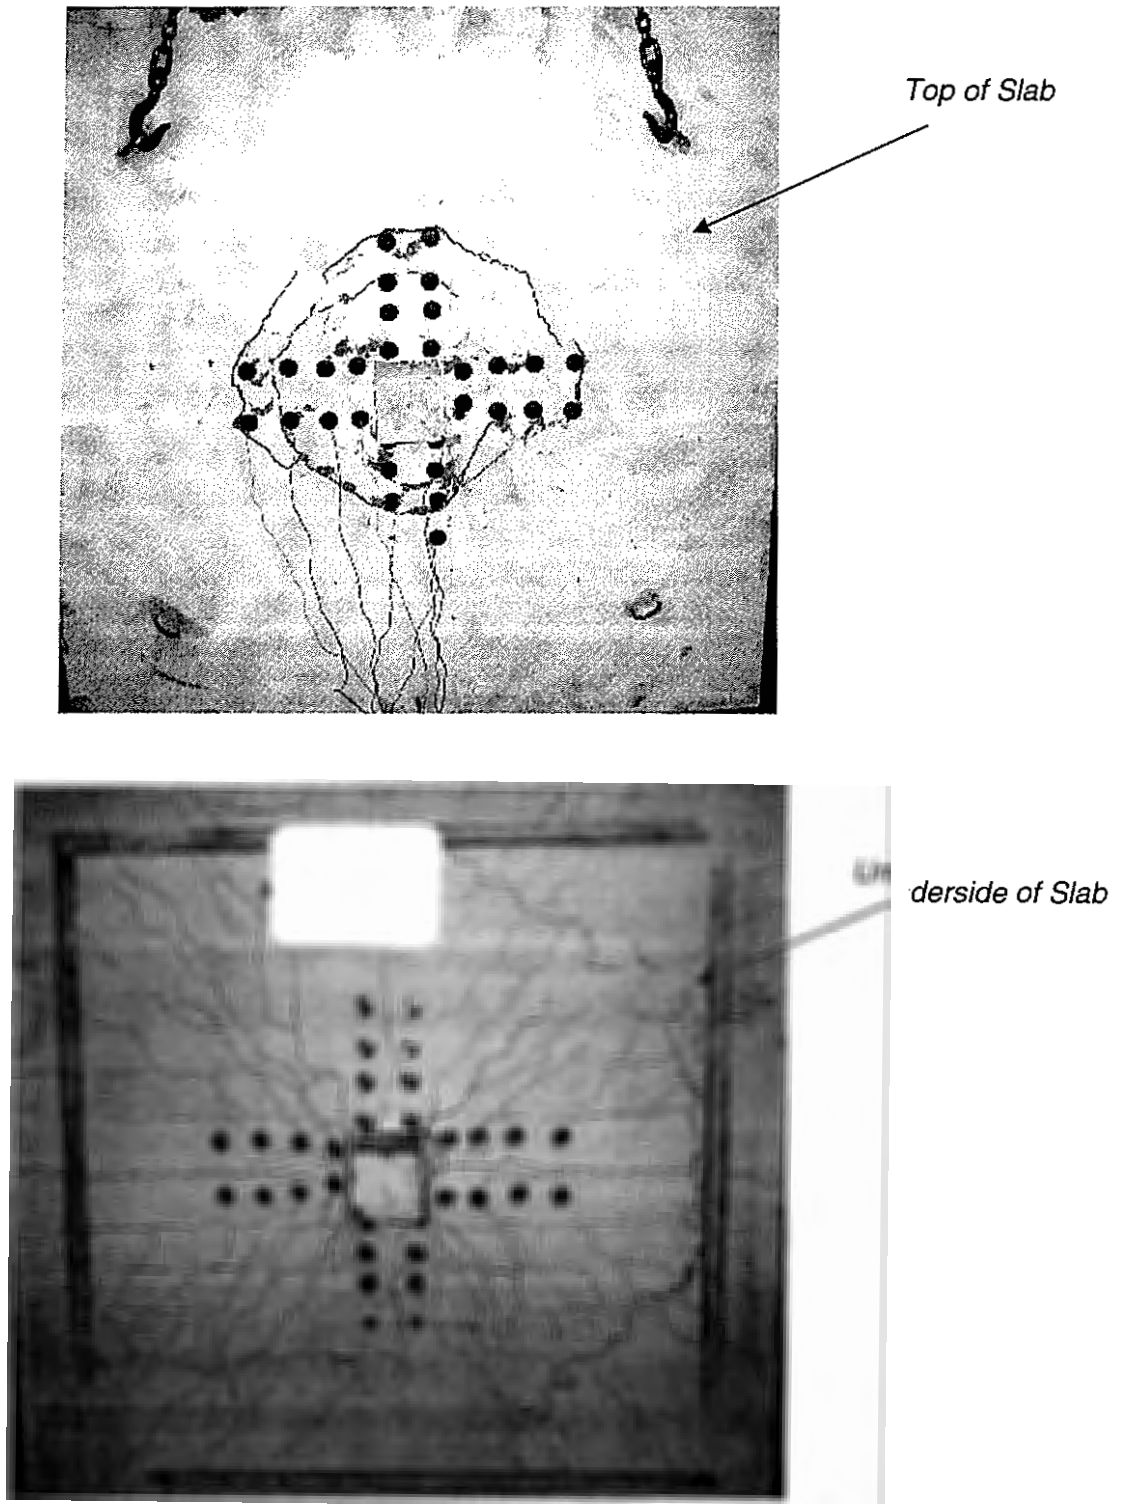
Crack Pattern after Failure of Specimen SB4
